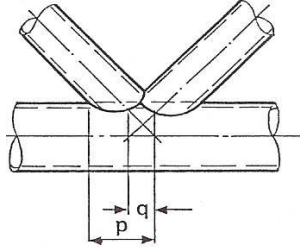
Overlap joint configuration with cross sections to be checked
